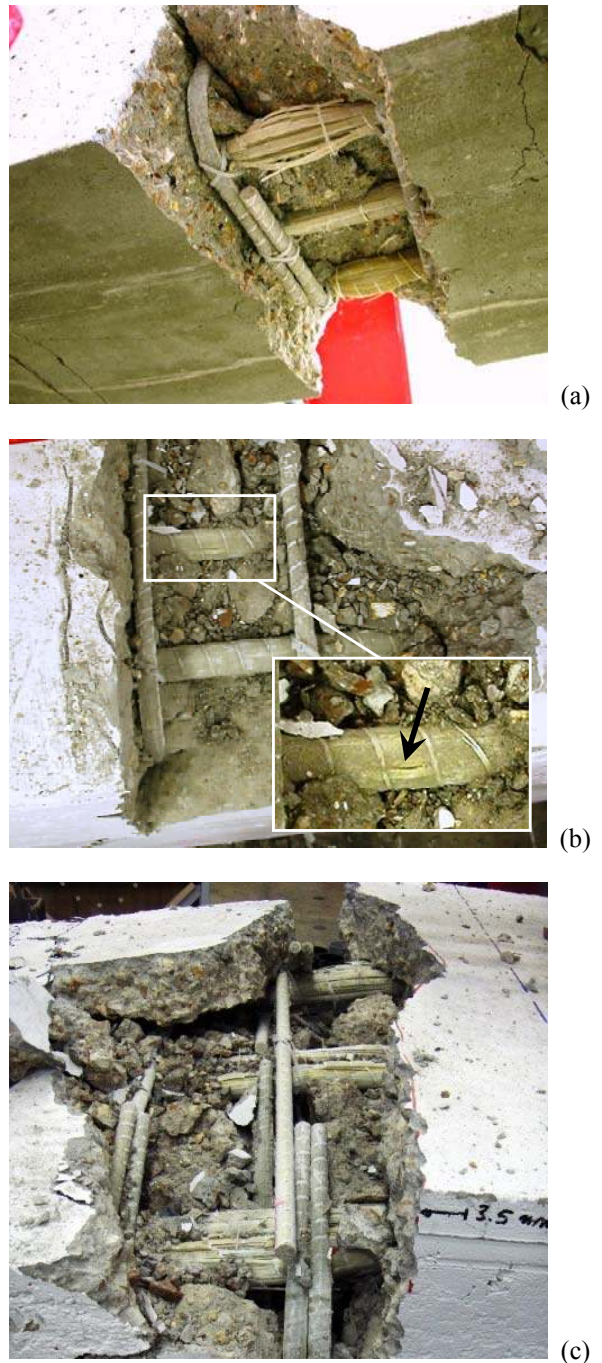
Photos of longitudinal #10 GFRP bars at failure section in Specimens 3A (a), 3B (b) and 4 (c).
